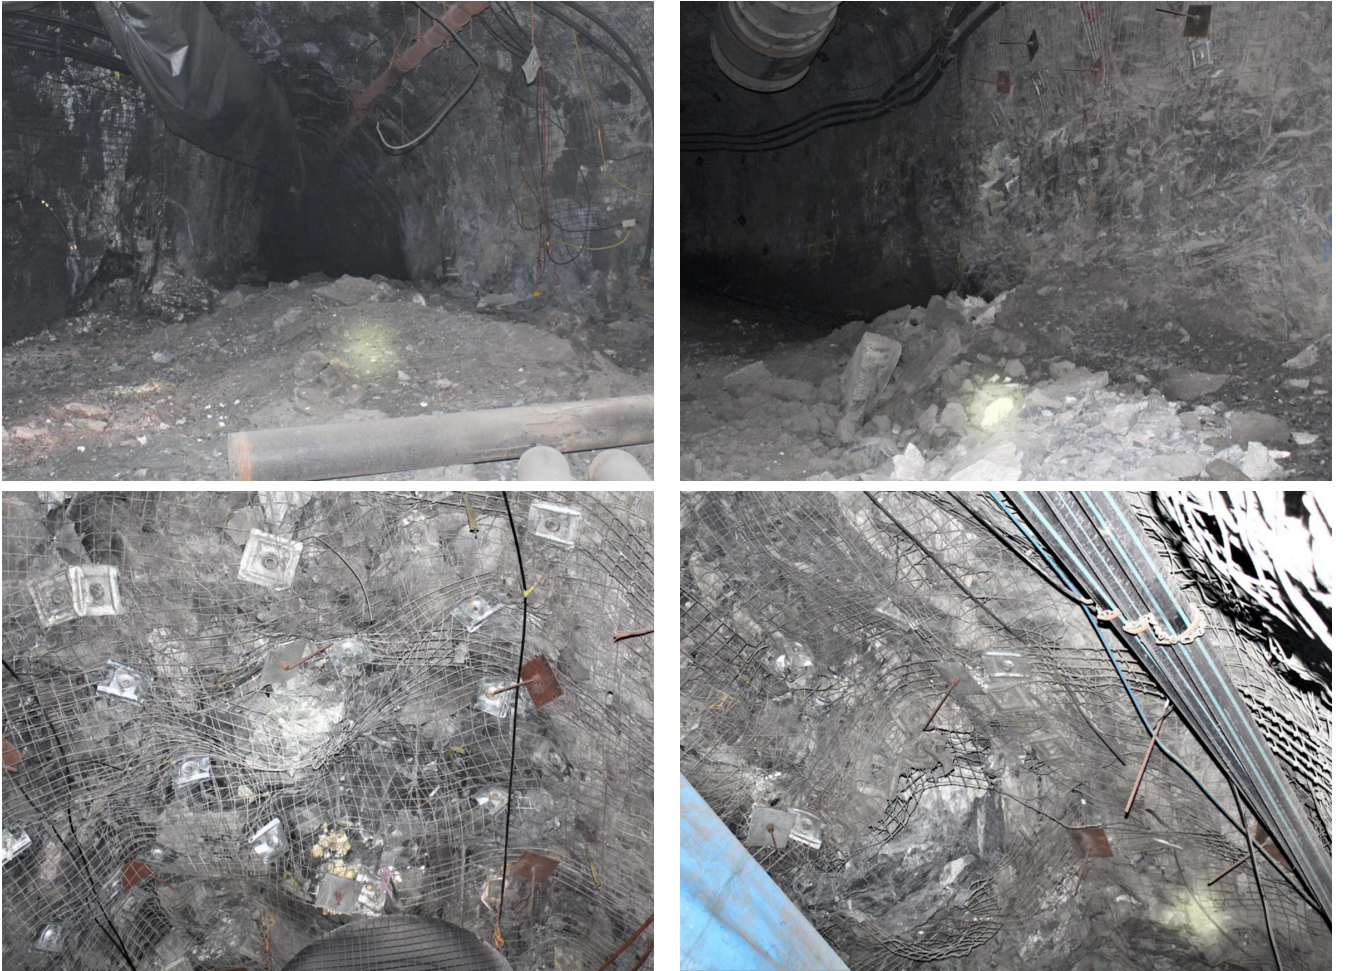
Damage observed underground: floor heave (*top*) and deformation of the supported roof (*bottom*).
